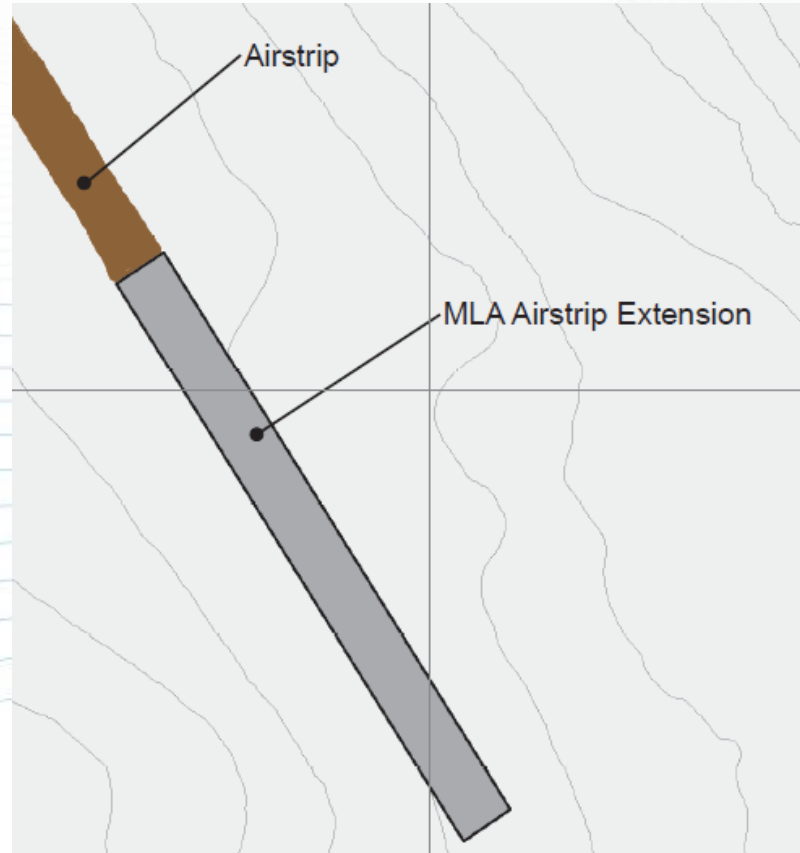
Proposed MLA Airstrip Extension (in orange), overlaying the existing MLA All-weather Airstrip, looking South
